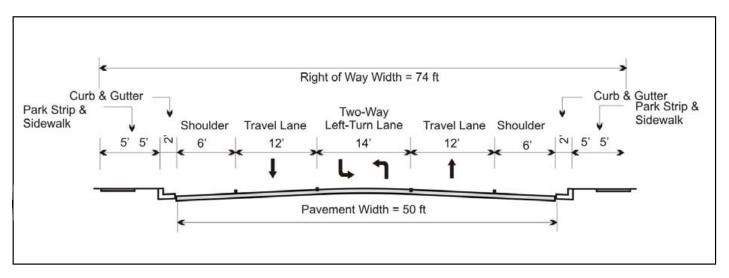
Three-lane Major Collector Street Cross-section, Between Intersections
